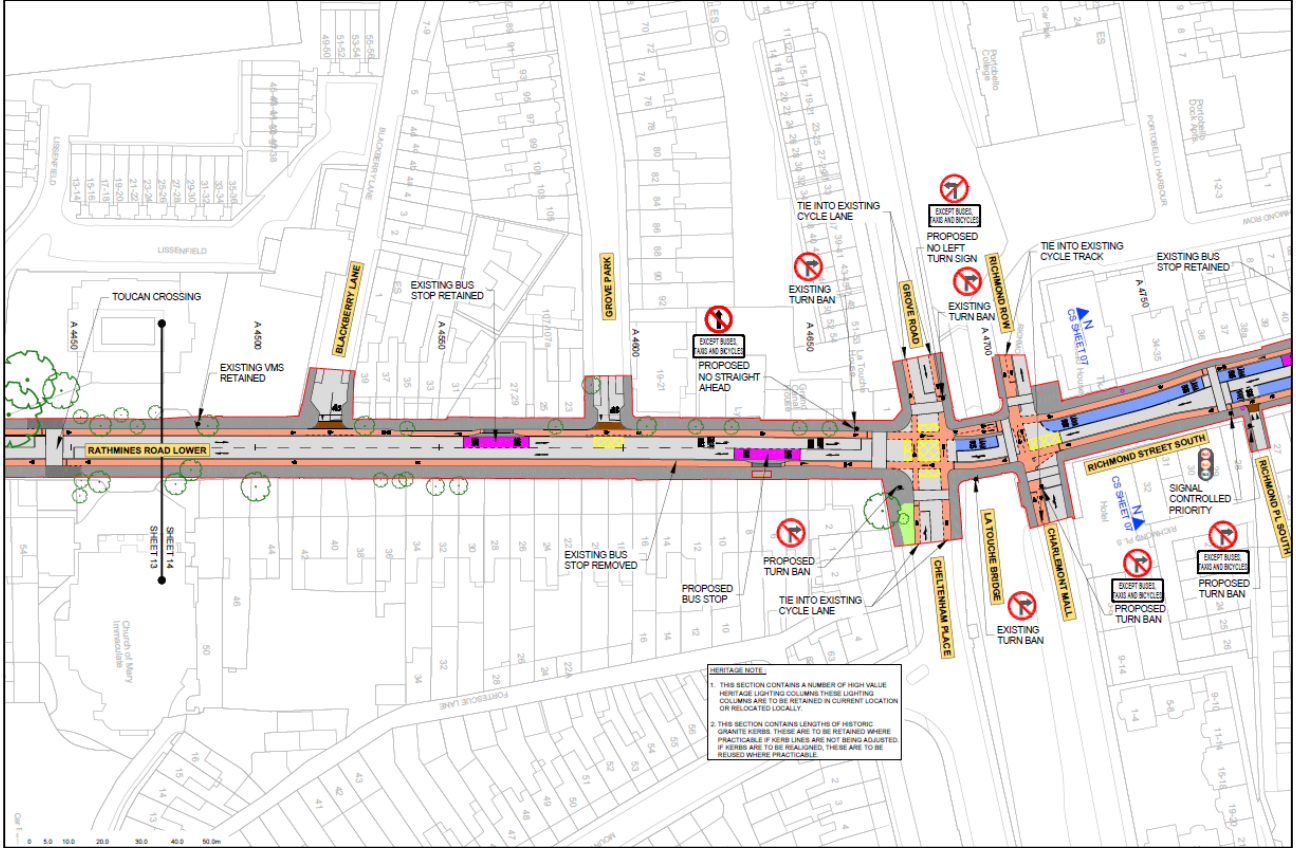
Extract from General Arrangement Drawings (Sheet 14)
